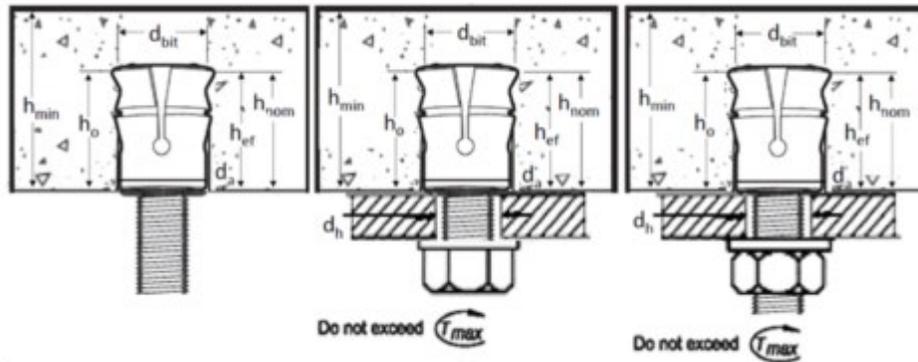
MINI-UNDERCUT+ ANCHOR INSTALLED WITH STEEL INSERT ELEMENT
